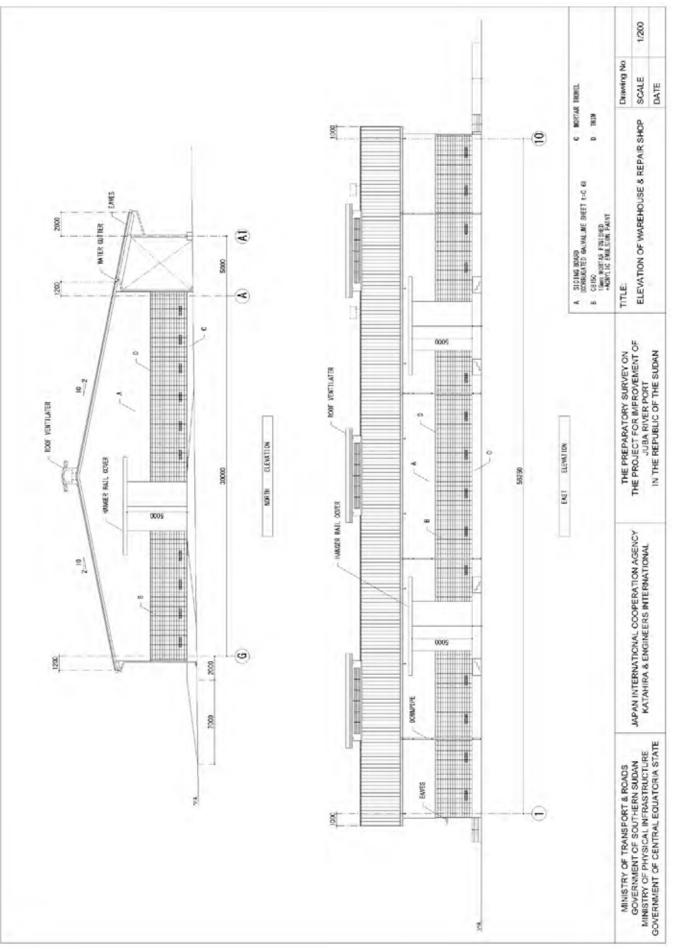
Elevation of Warehouse & Repair Shop
